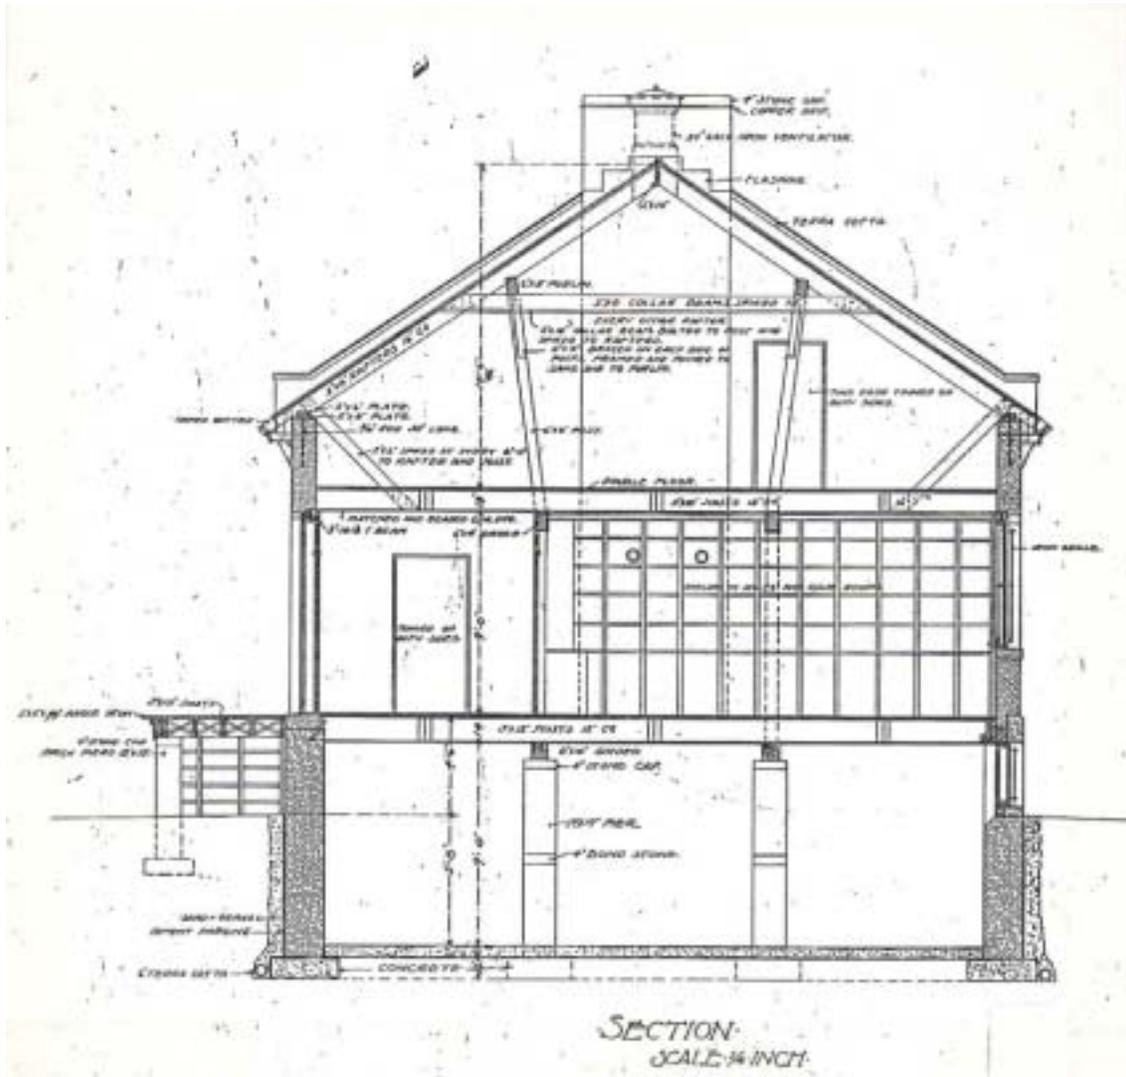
Section looking north, as illustrated on revised drawings, 1897. Framing shown is extant today, along with a later second story.
